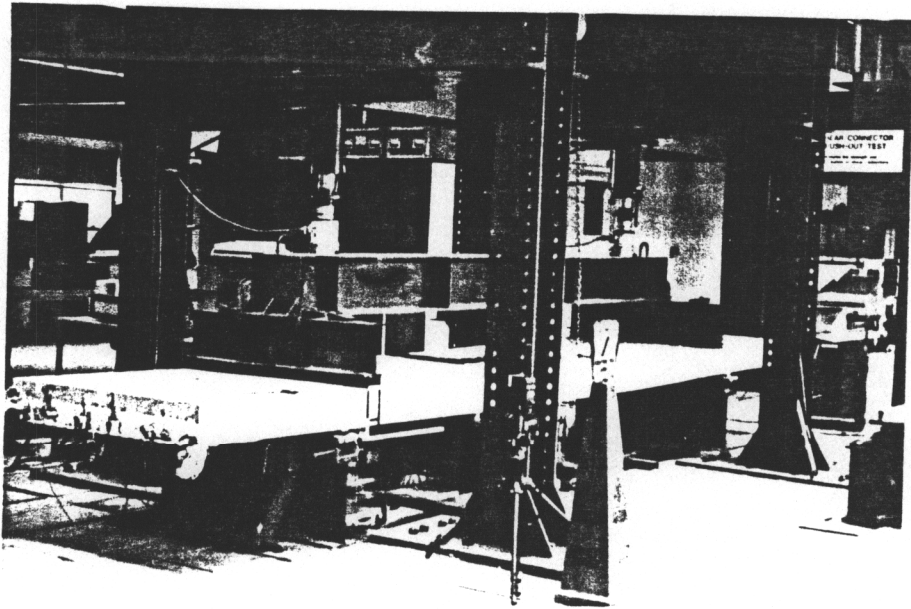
Overview of Test Setup (Patrick and Bridge 1992)
